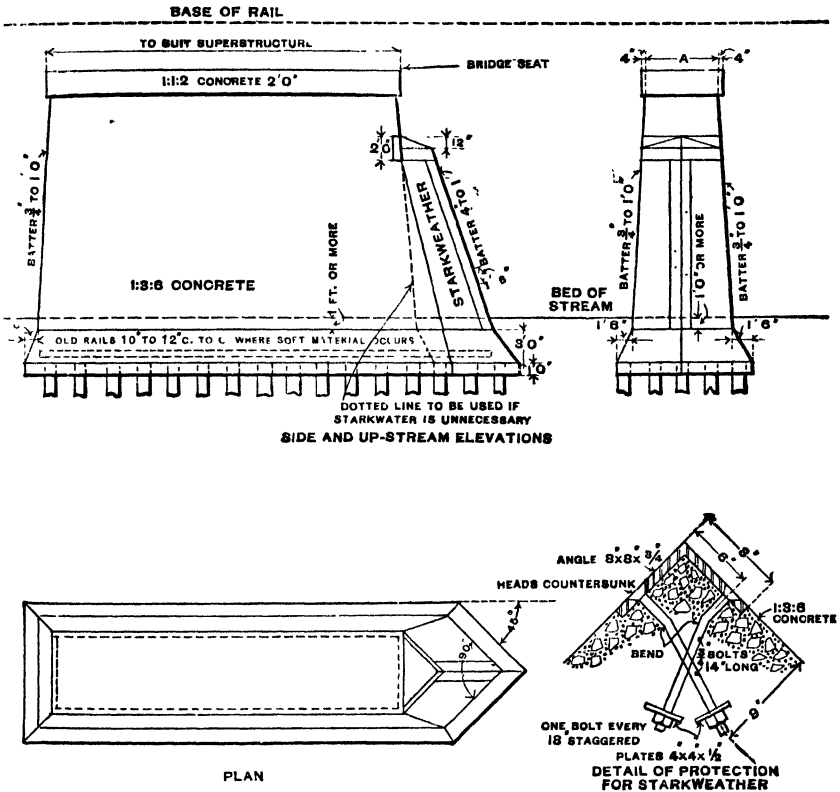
Standard Concrete Bridge Pier, N. Y. C. R. R., G. W. Kittredge, Chief Engineer. (See p. 690.)
